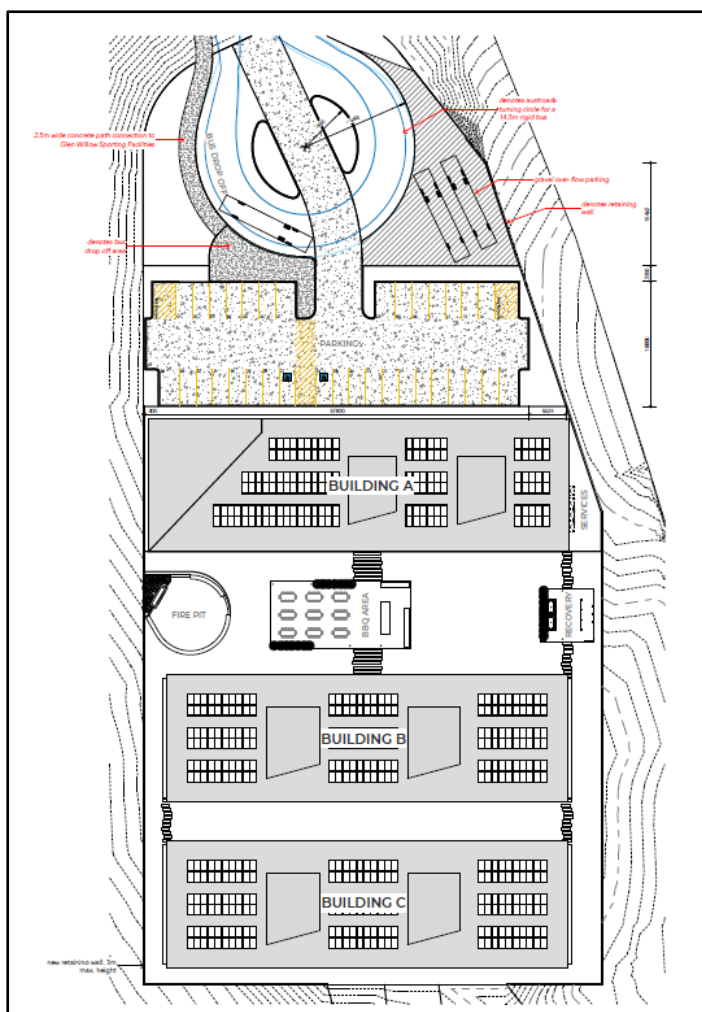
Extract from Architectural Plans - Proposed Part Site Plan
